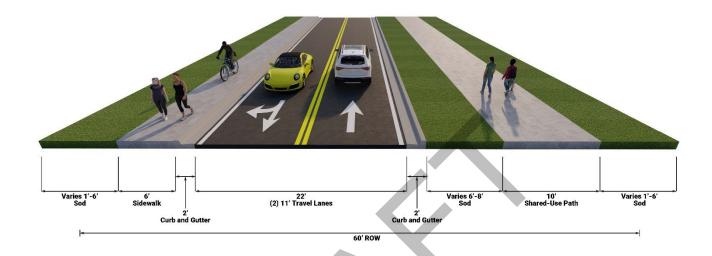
NW Quadrant Road – Typical Section from Sta. 206+80.95 to Sta. 207+25.48
